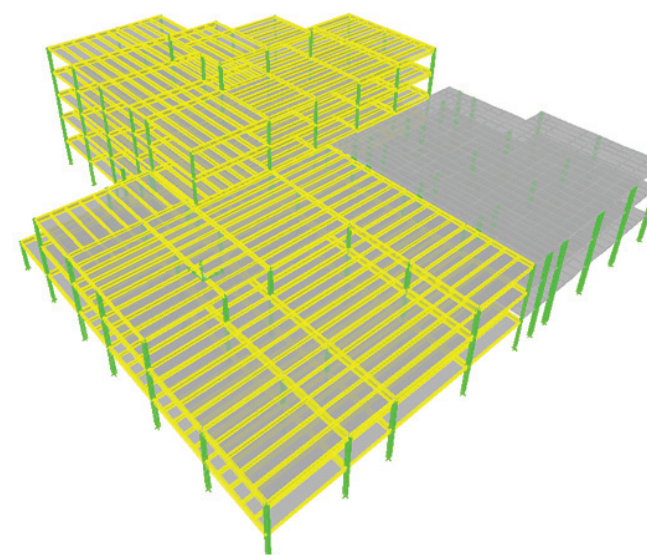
Structural model showing the proposed operating room addition and existing Dartmouth General Hospital used to analyze structural impacts at junction between existing and new (Grids M-S and 1-14).
